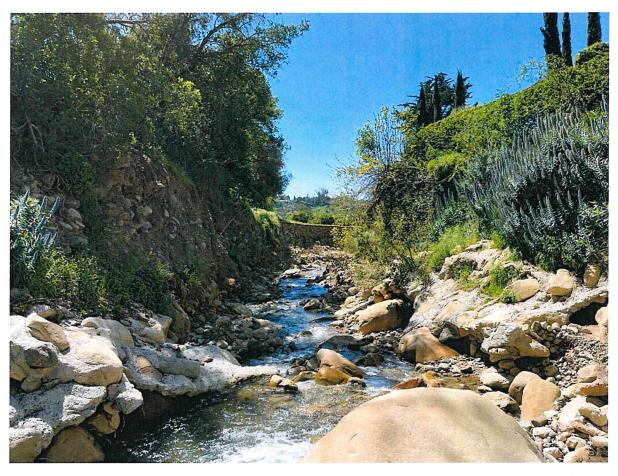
View looking downstream. concrete on both toe slopes. Used to connect into a grade control structure that is failing.
